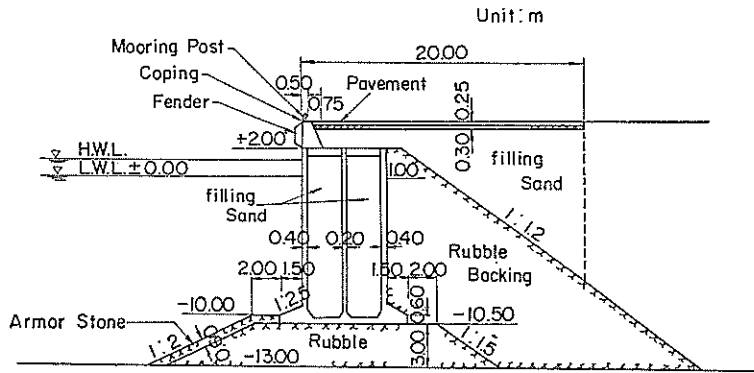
Standard section of caisson type quaywall (Murata et al.)
